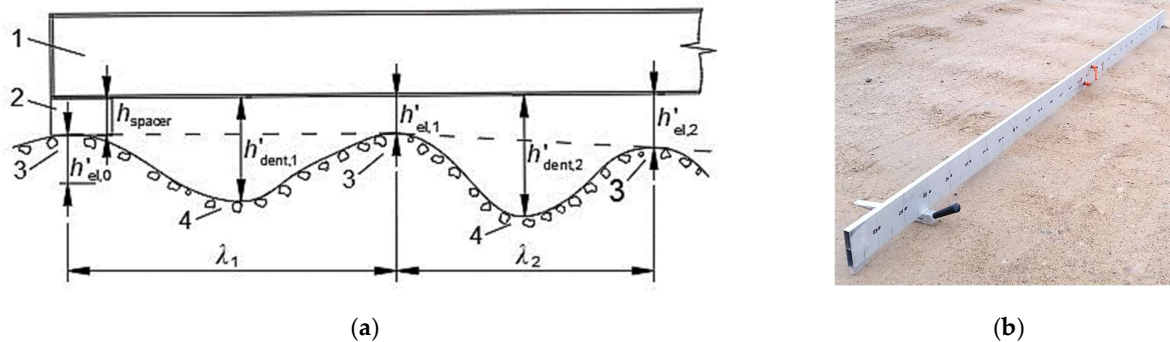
The measurement of gravel road roughness applying a straightedge: (a) measurement scheme 1 – straightedge of 3 meters in length; 2 – added spacer; 3 – pavement elevation; 4 – pavement dent; (b) measurement of gravel pavement.
